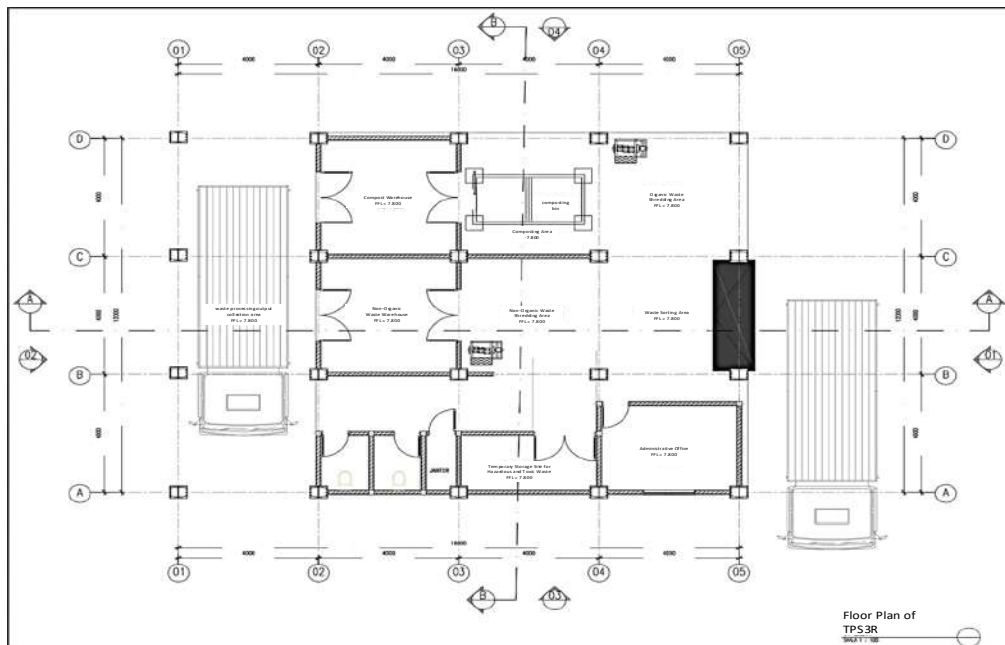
Building plan the waste management site reduce-reuse-recycle (TPS3R).
